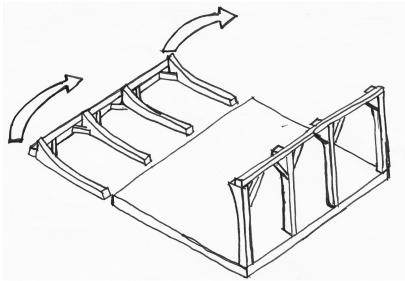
The English barn is framed by first raising the side wall. Drawn by the author after an illustration by Thomas Hubka in his *Big House, Little House, Back House, Barn: The Connected Farm Buildings of New England*, 1984, 58.
